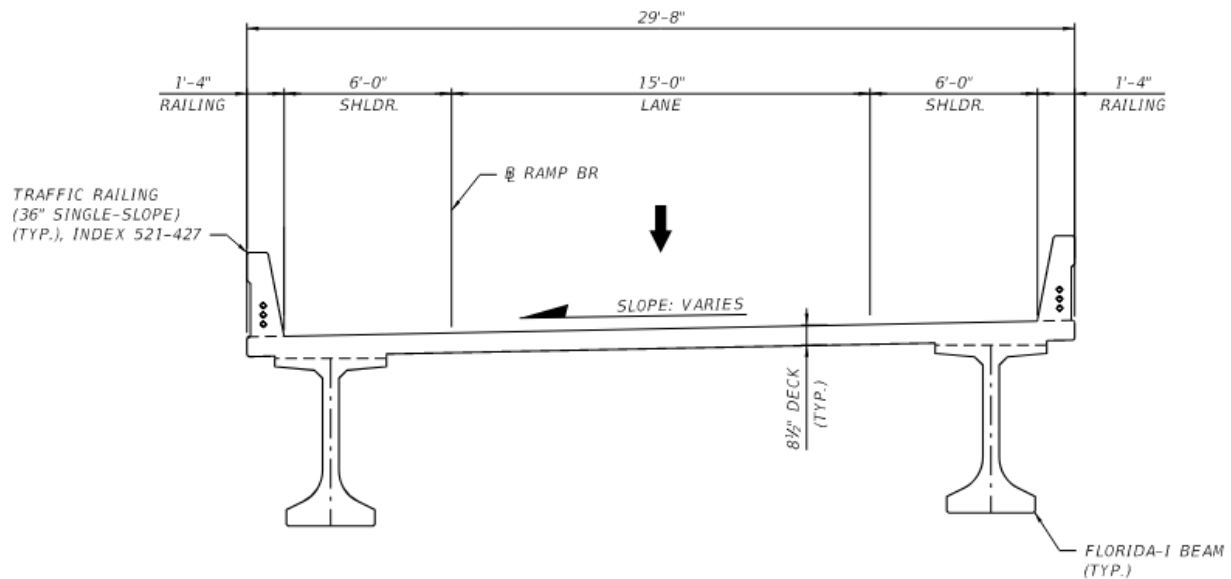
Braided Ramp over Ramp A Bridge Typical Section
